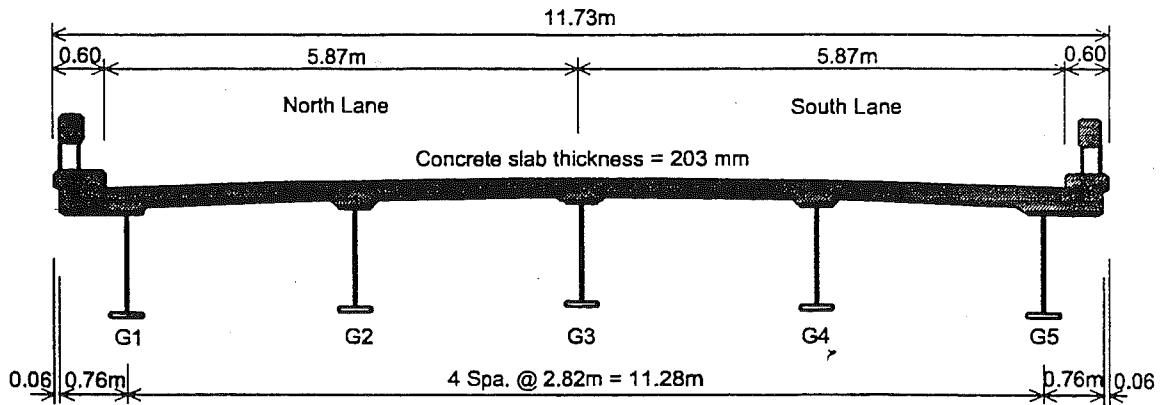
Cross-Section of Bridge NDN/I69 (S03-13074).
